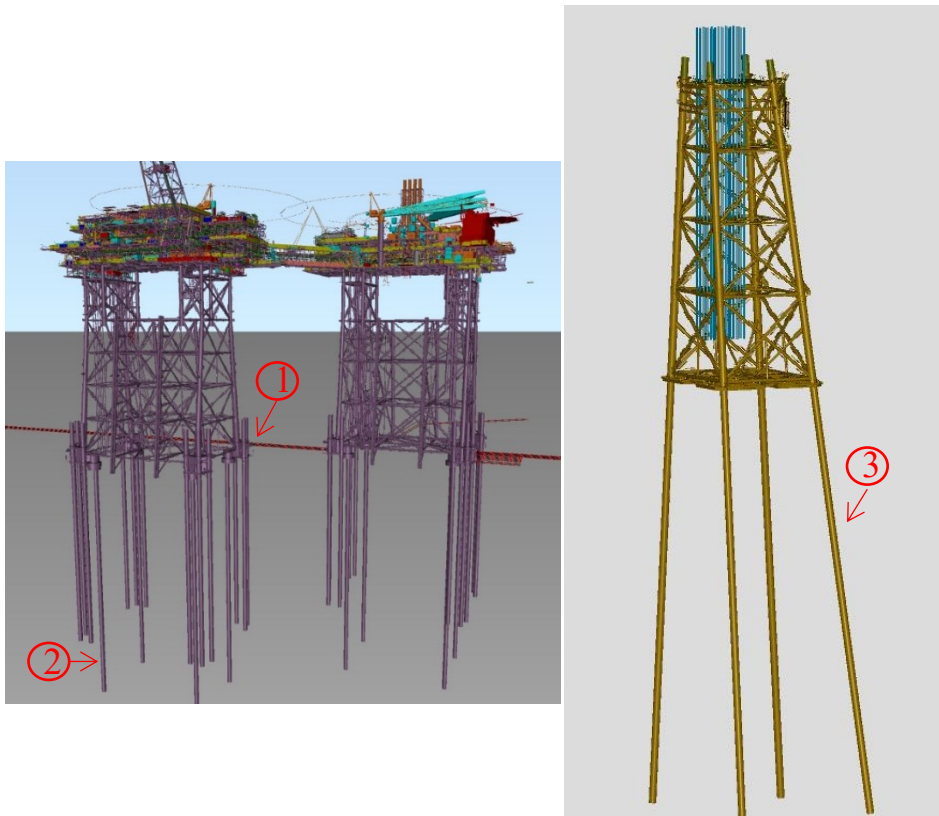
Foundation pile: 1) skirt pile; 2) pin pile; 3) main pile.
